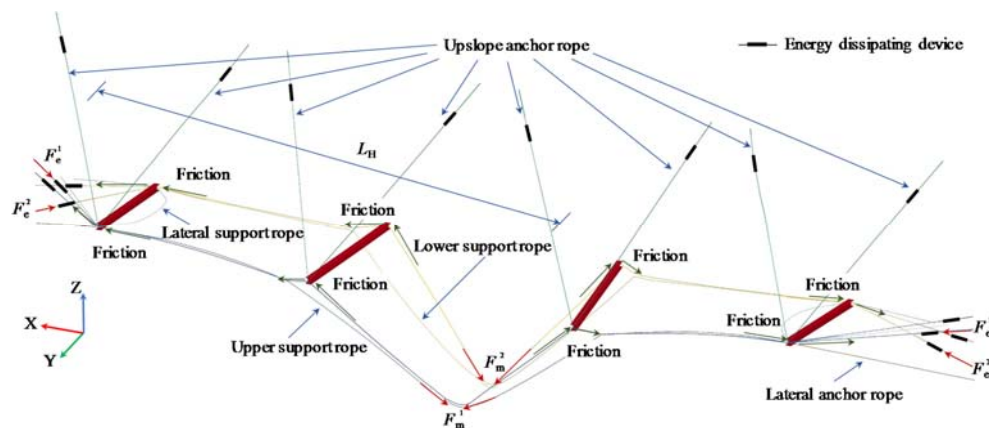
Layout of Support Ropes in Typical Flexible Rockfall Barrier System
